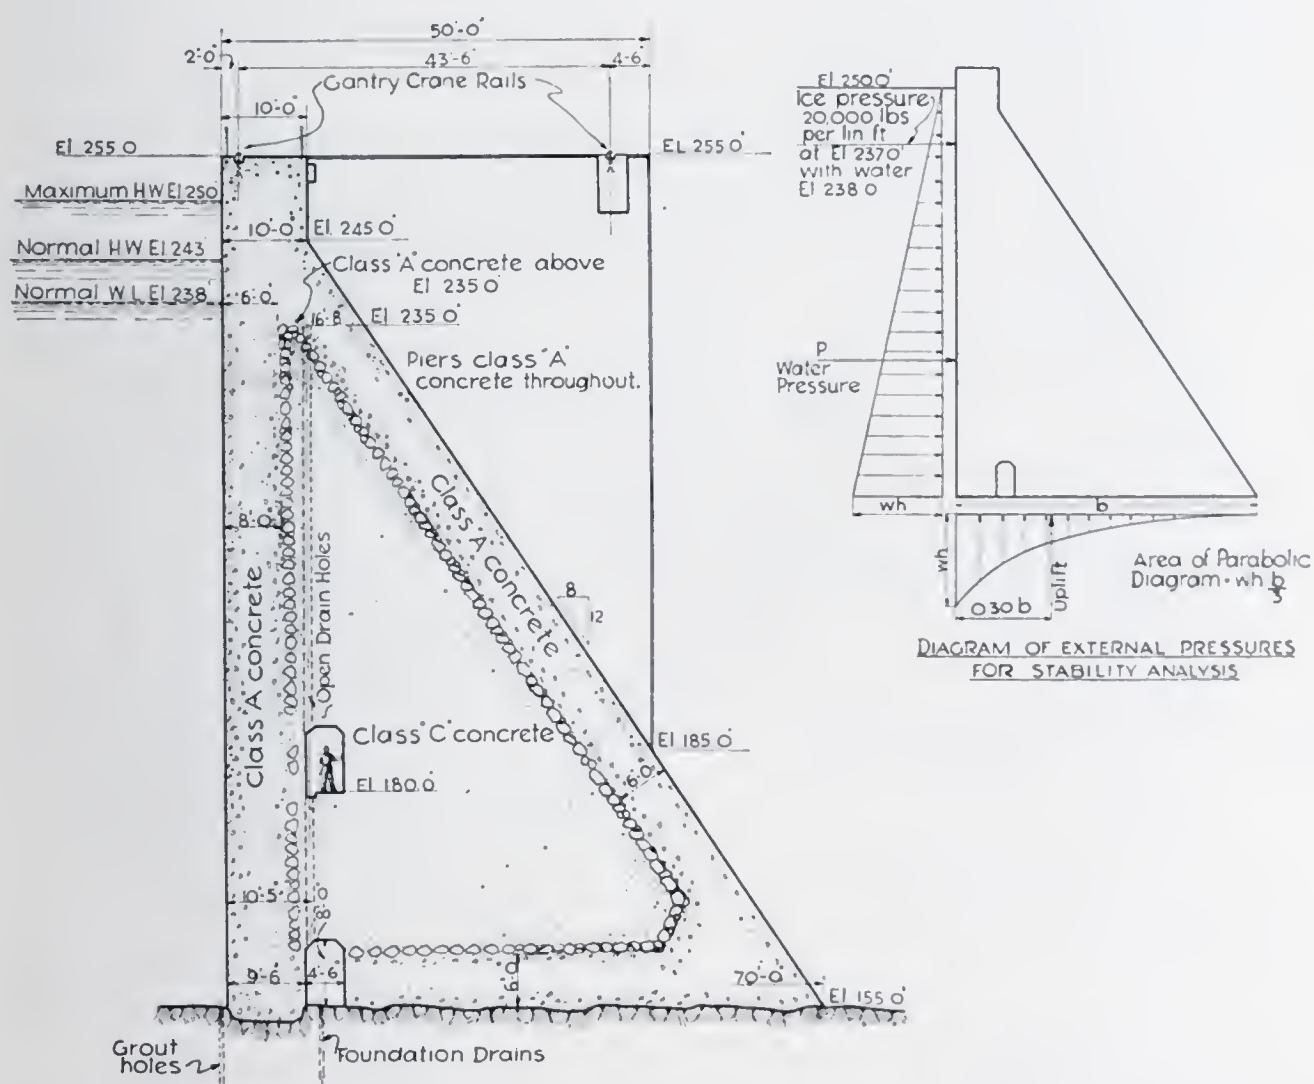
Cross-Section through Bulkhead Section of Main Dam.
